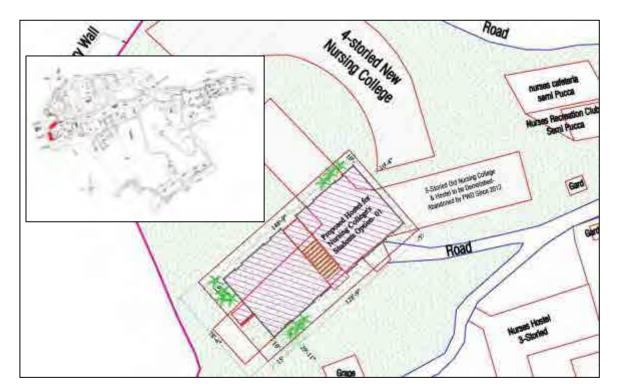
Candidate Site's Location and Layout Plan for Construction of the Nursing College in Barisal
